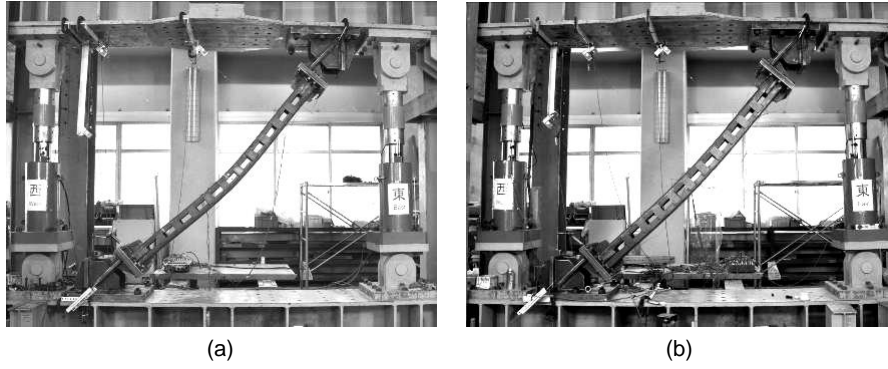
Deformed shape of NBB specimens observed at a 1.5% SDR; (a) Specimen 1, (b) Specimen 2
